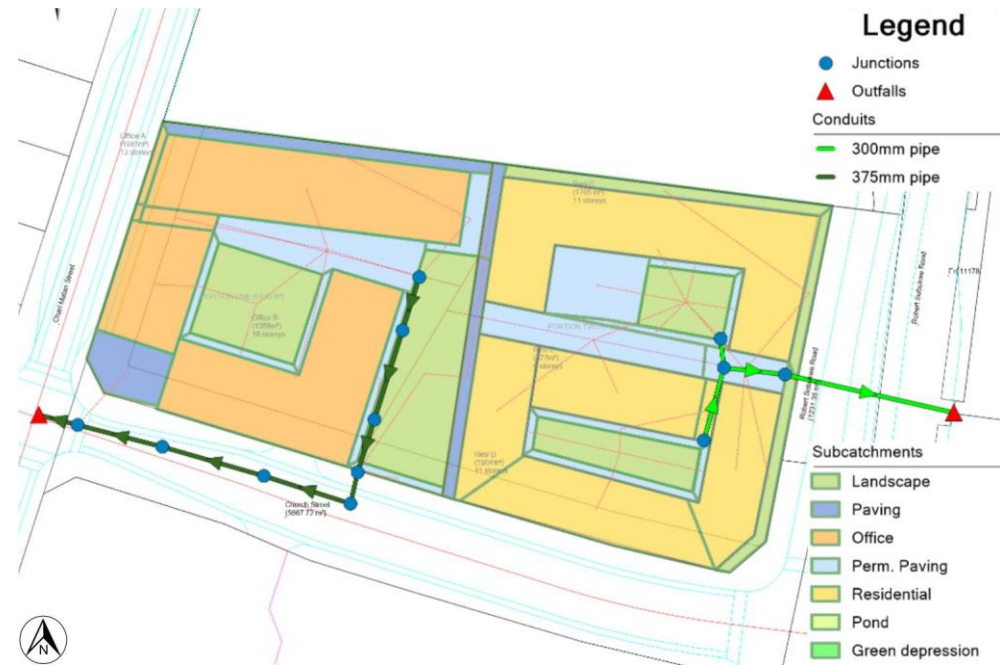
On-site stormwater treatment and routes (Zutari, 2025)
